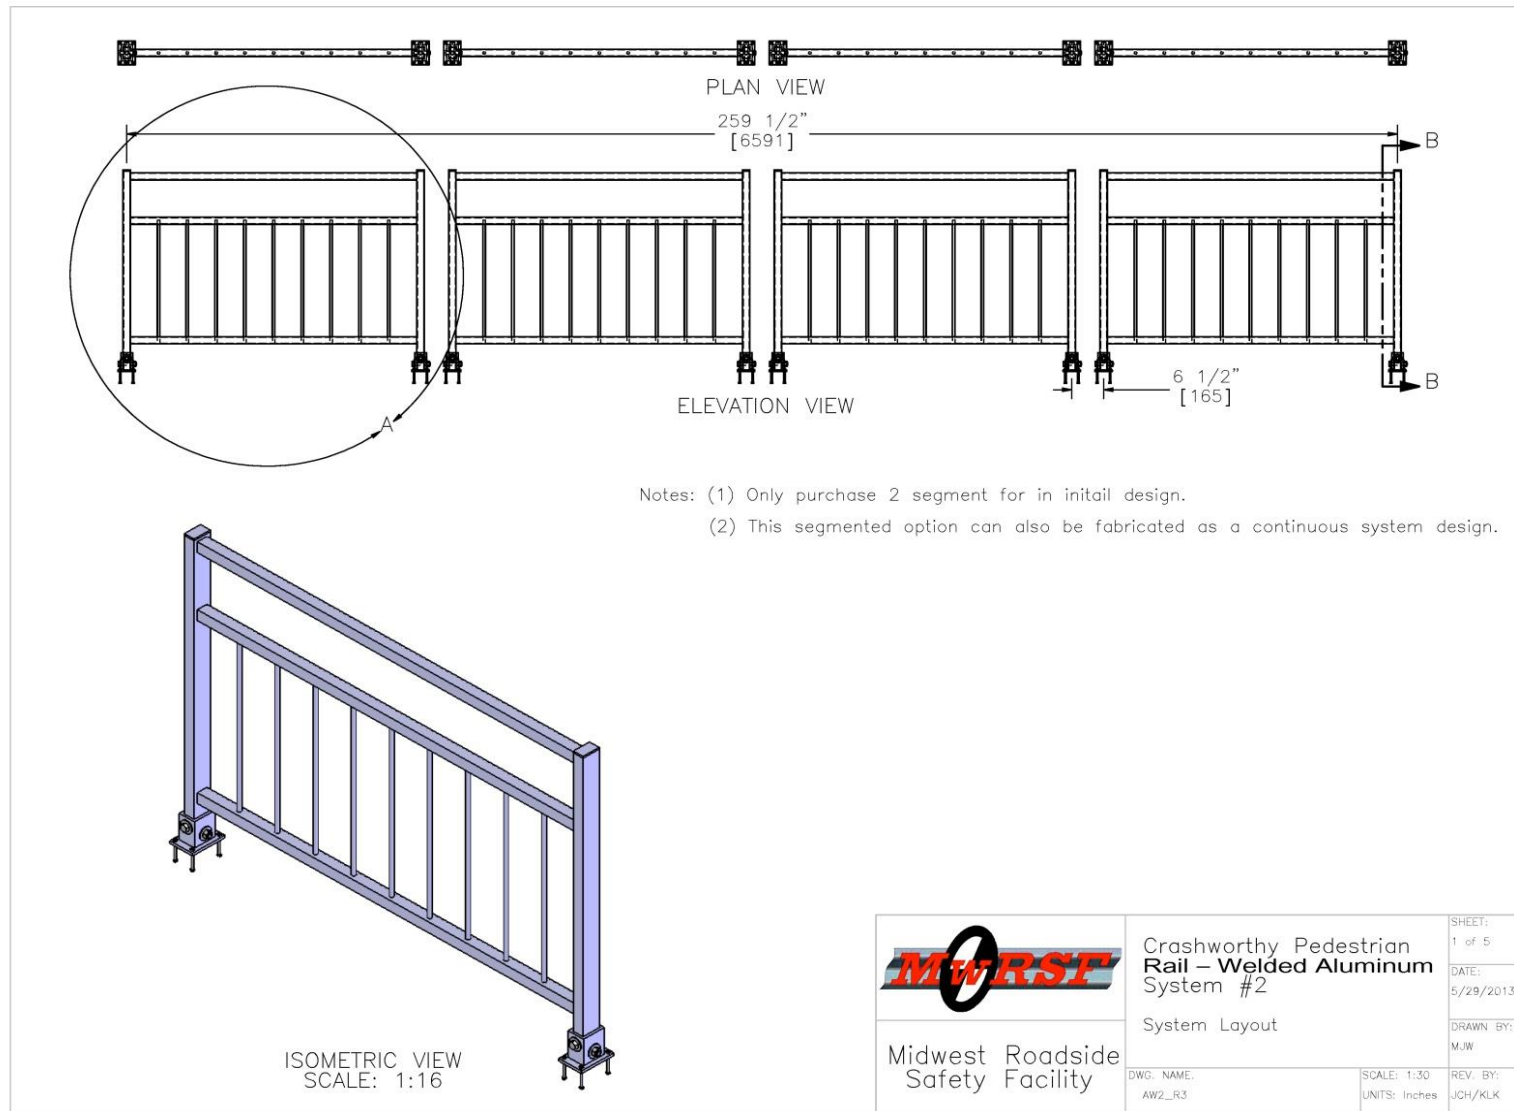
Welded Aluminum Rail, Design Concept AW2 (Sheet 1 of 5)
